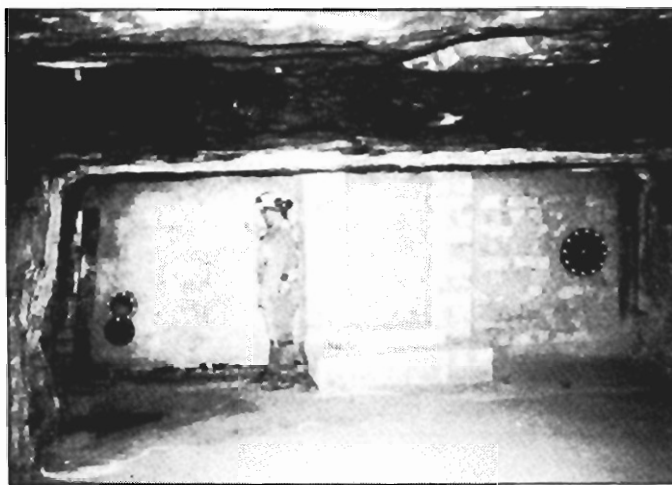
Three water trap design openings installed through a solid-concrete-block seal.
